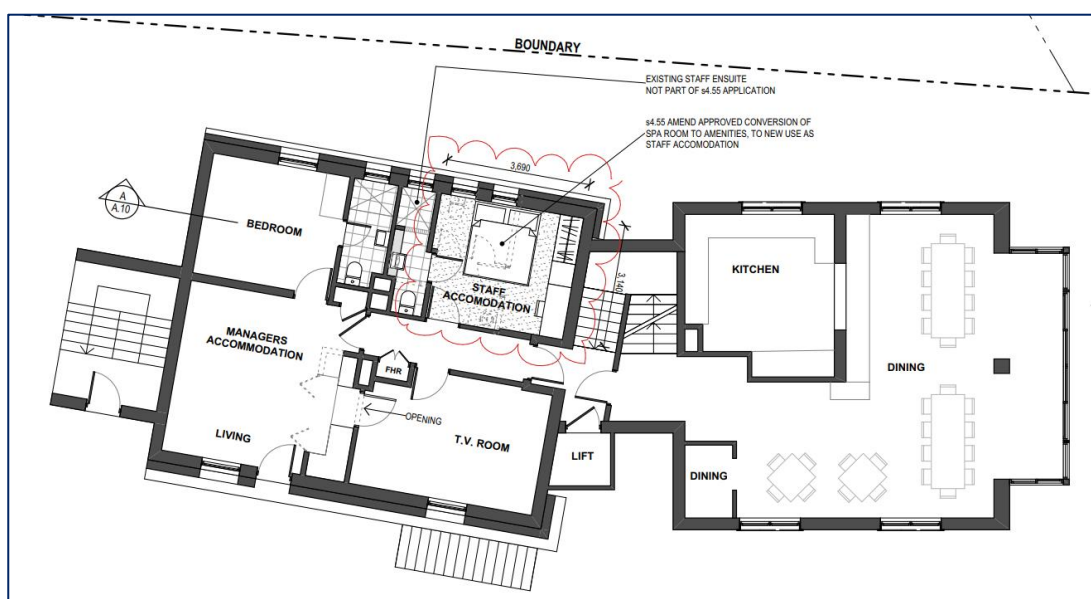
| Level 2 staff accommodation – former spa and sauna room (Source: Applicant's documentation)
